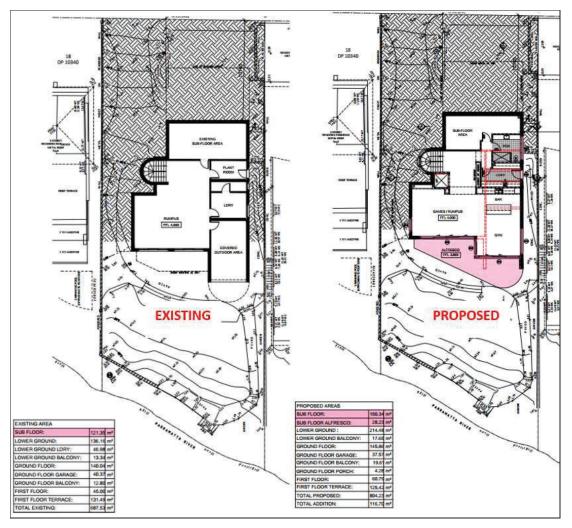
Proposed floor plan changes to subfloor level Source: Architectural Plans prepared by Construction by Design
